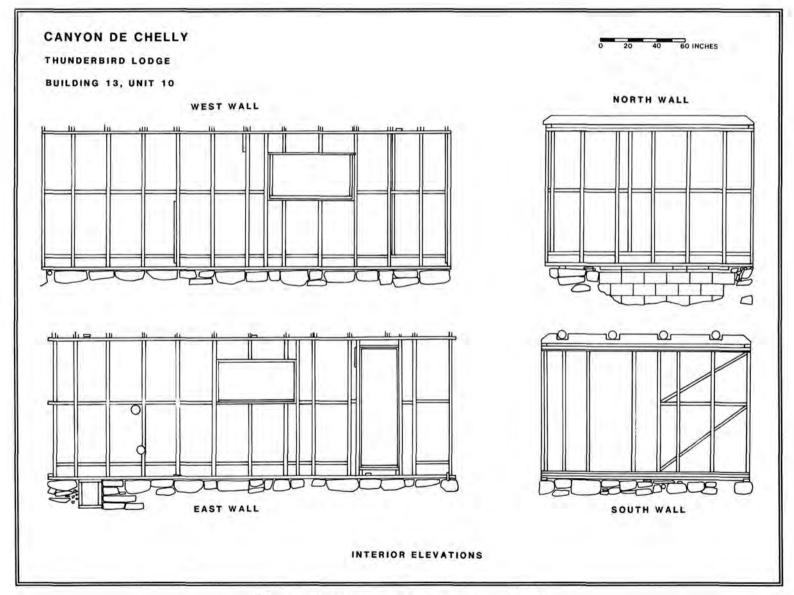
Elevations of Building 13, Guest Unit 10.
